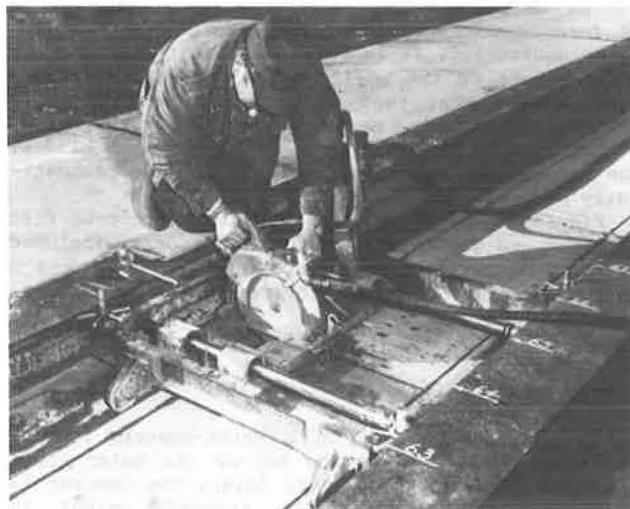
Machine for installing saw-cut grooves in the test sections.
